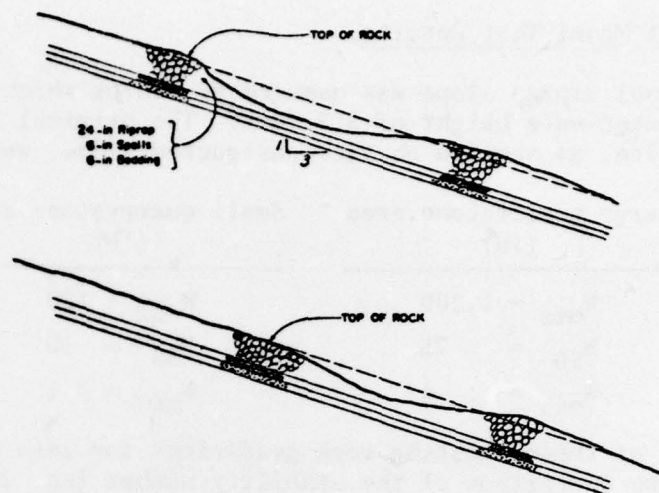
Typical damaged riprap sections (U.S. Army Engineer District, Omaha, 1969).
